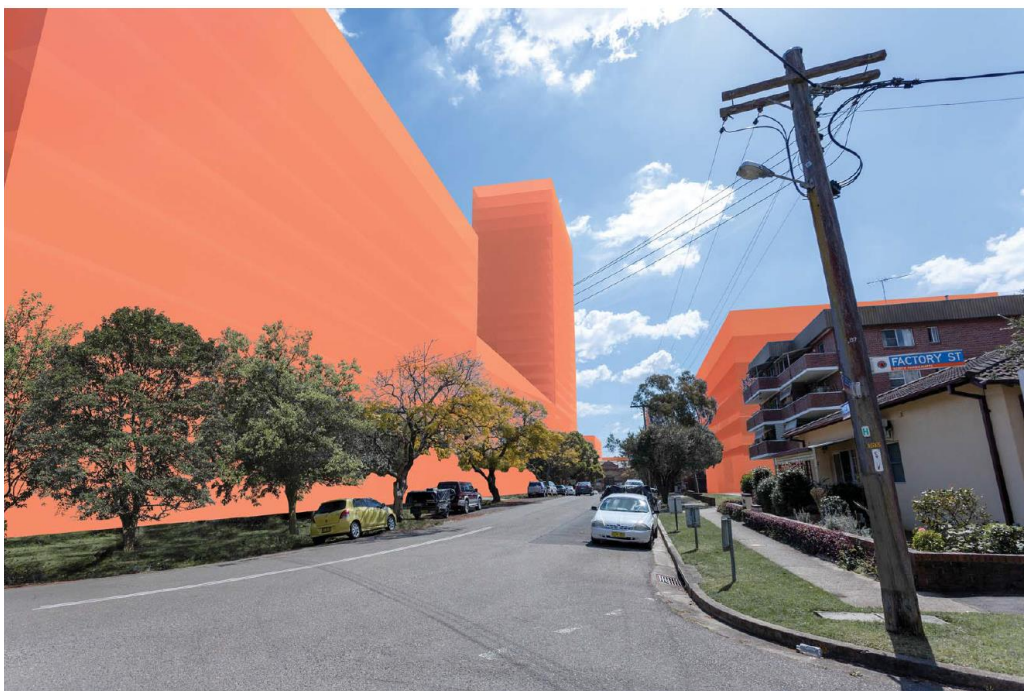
View from viewing point 6 on Figure 66 north along New Street from its intersection with Factory Street showing the massing of proposed new buildings (shaded orange) in lot G1 (left), lot B (in distance) and lot A3 (right) of the PNUR ILP. The visual impact of the actual buildings will be attenuated by implementation of DCP controls on design, setbacks, materials, exterior finishes and landscaping. (Source: Virtual Ideas / AJ + C)
